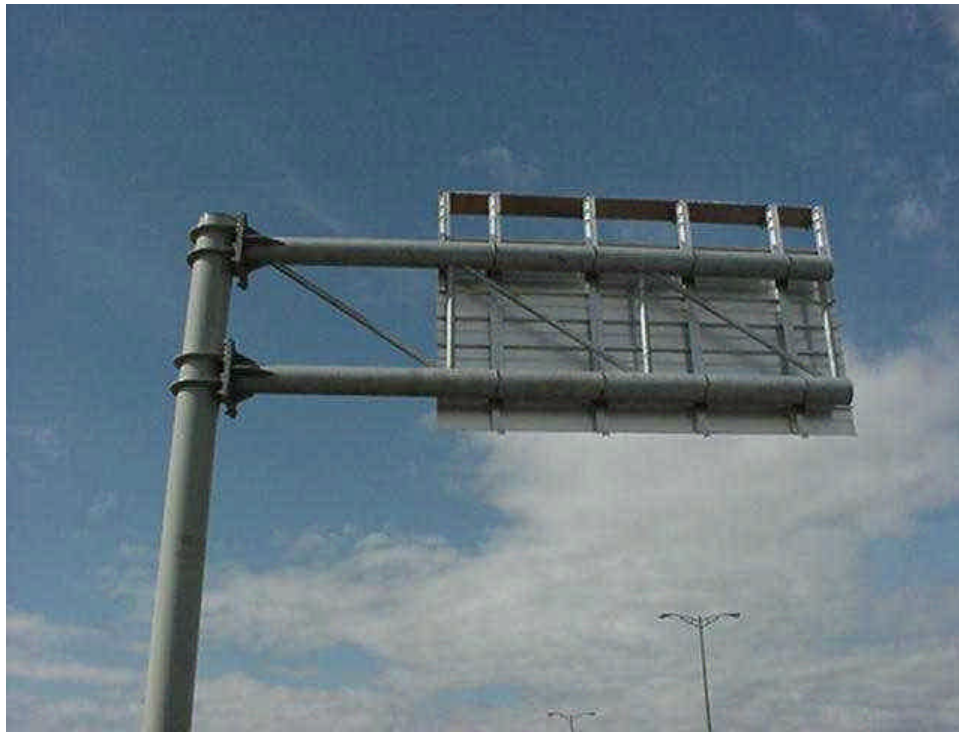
3      Connection – Sign, Tri-Chord Sign Support
